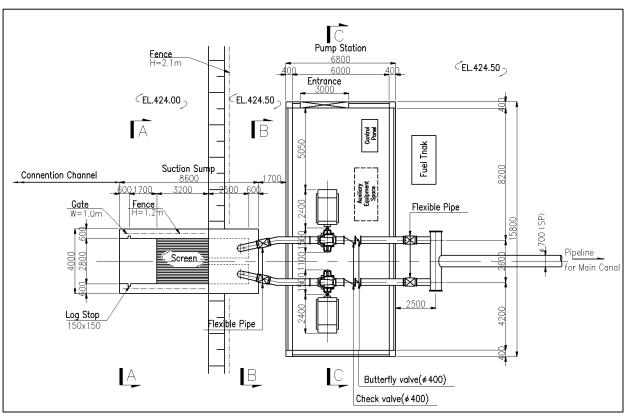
Plan and Section of Pump Station Building (Plan)
